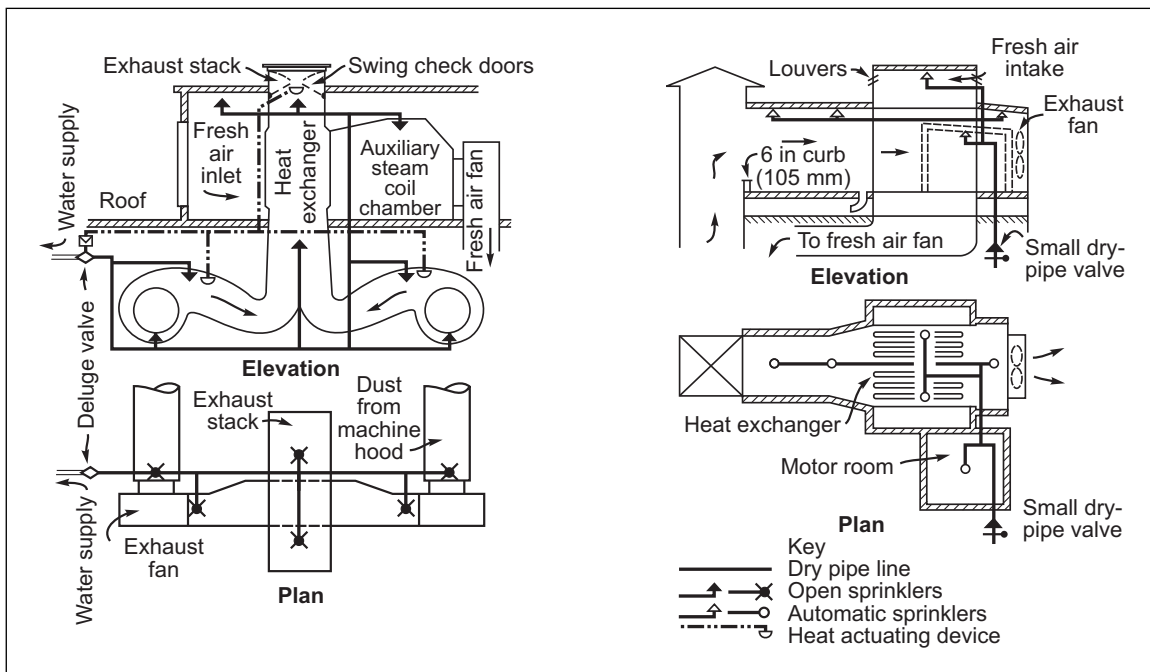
Example of dry-type economizer automatic sprinkler arrangement
